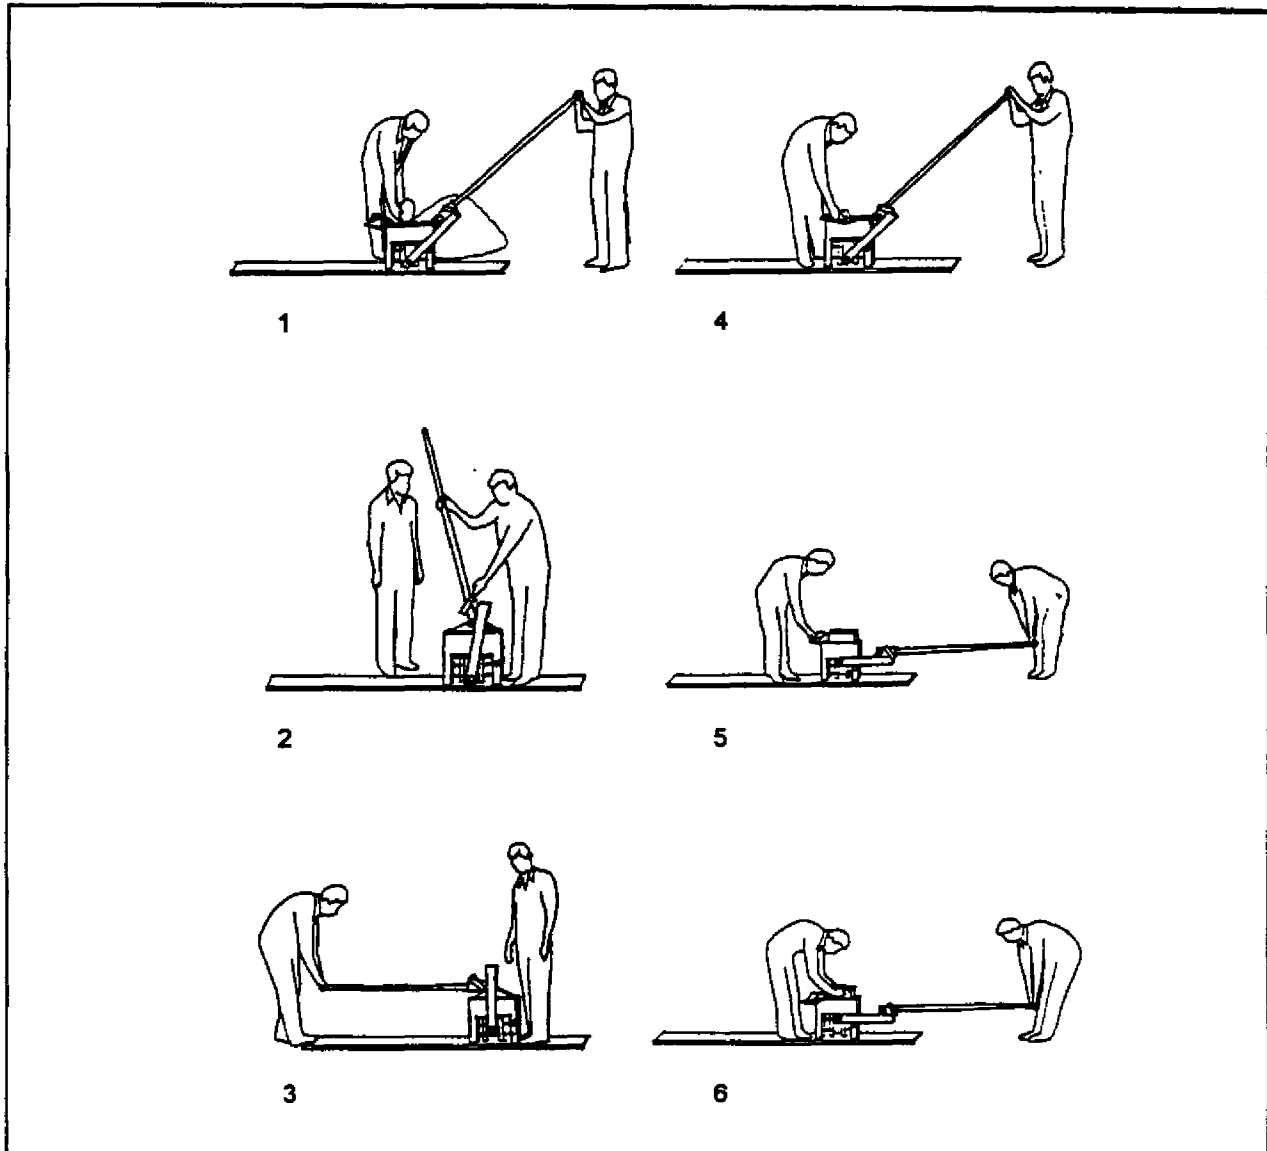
Molding of Stabilized Soil blocks with a Cinva Ram Press [12].
